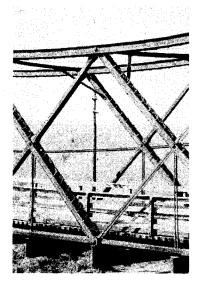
Detail of Figure 10 truss member intersections. Note pin connections at all joints. (Amherst County, photo no. 12520-7-12)
